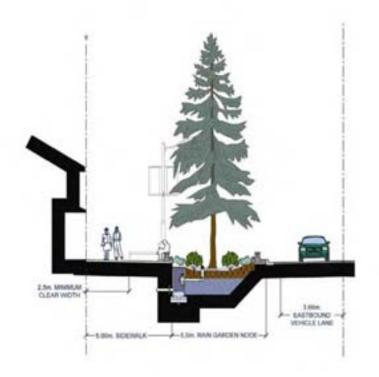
Argyle Street Rain Garden Detail Section and Profile
